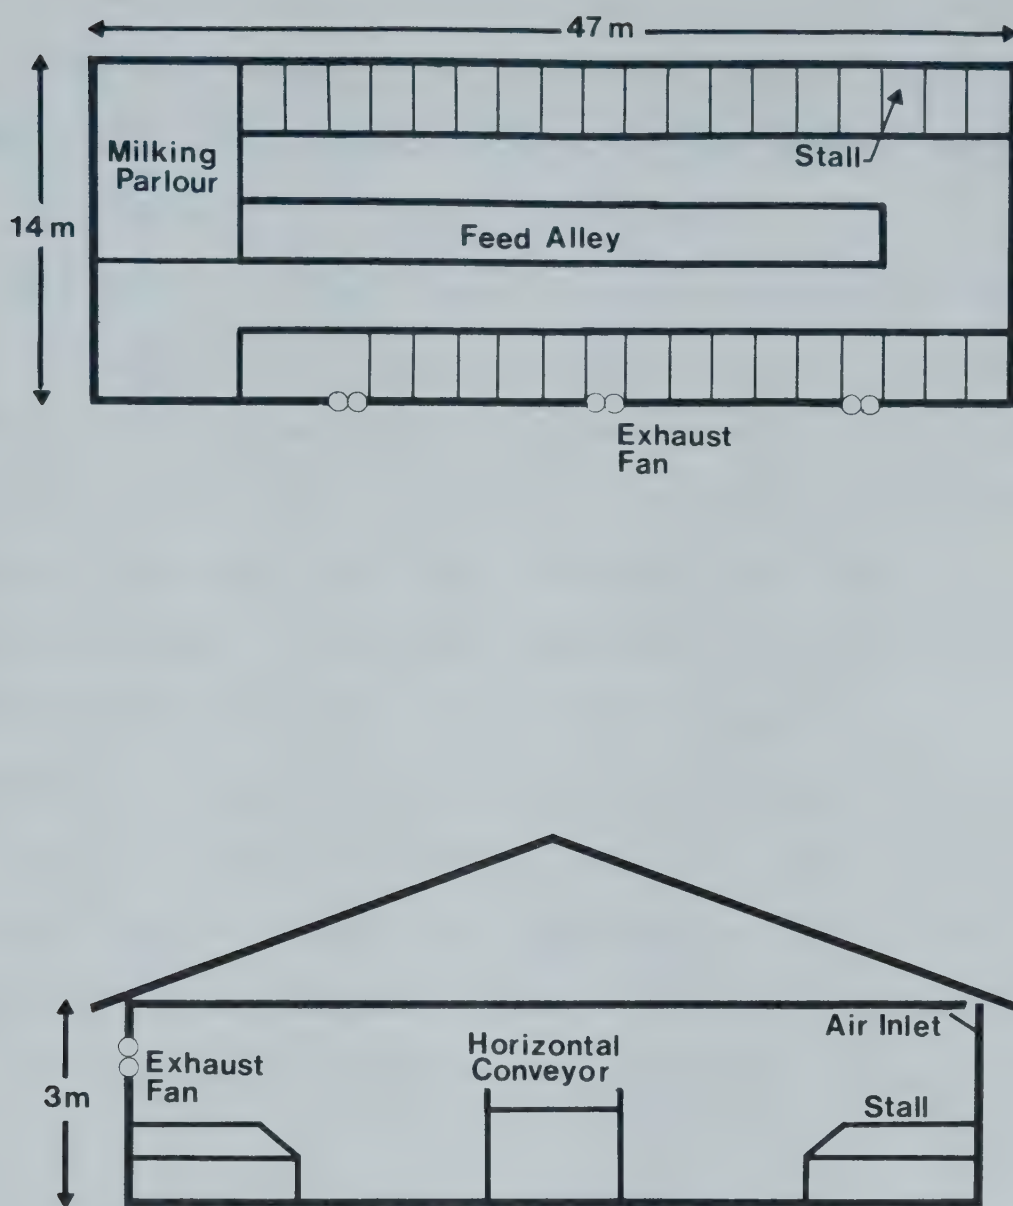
Barn SO-1 – floor plan and cross-section.
